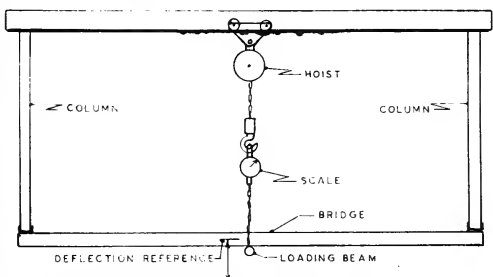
SKETCH OF BRIDGE TEST SET-UP
